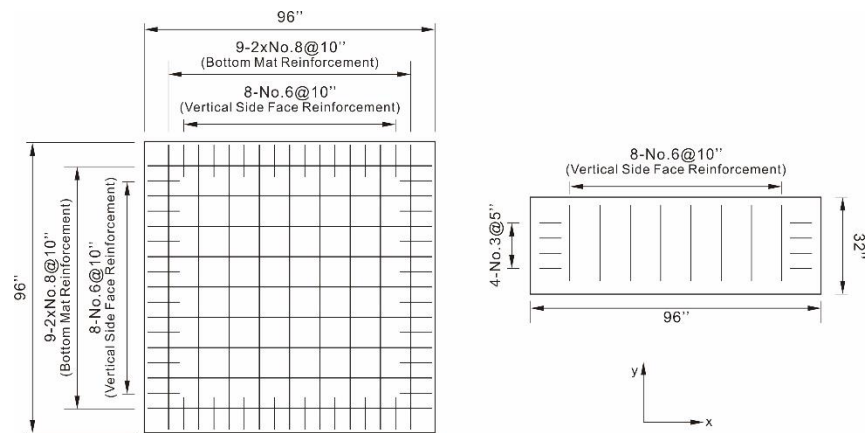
Details of I-2 footing specimen (FHWA/TX-21/0-6953-R1)
